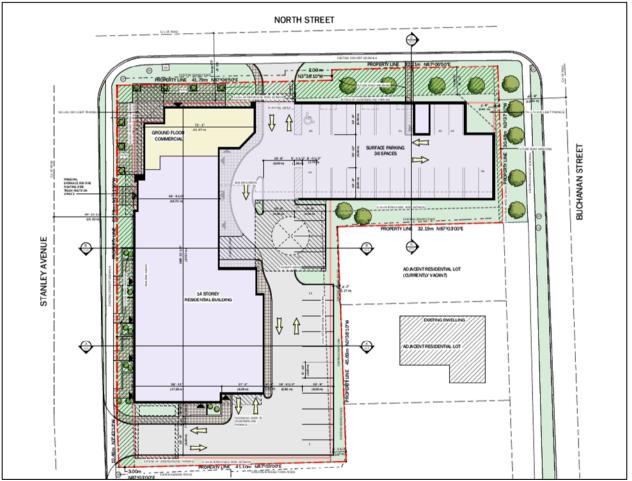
Preliminary Site Plan prepared by ACK Architects Studio Inc.
